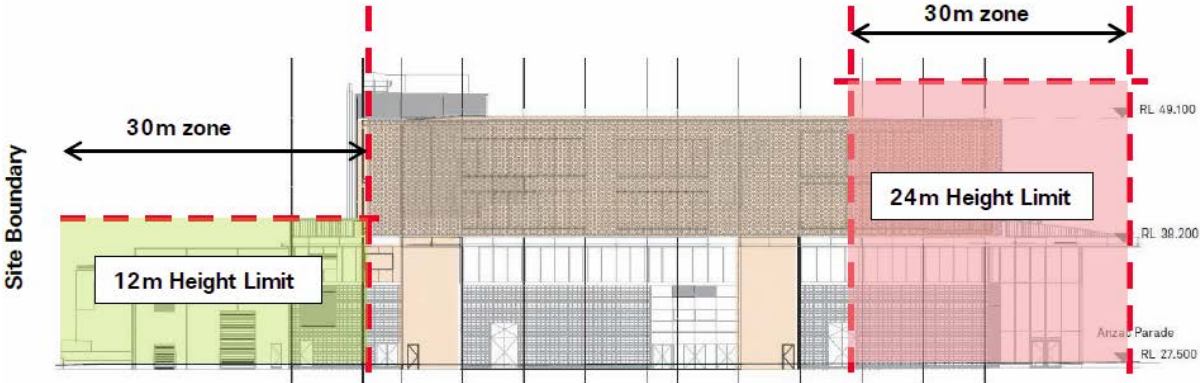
Southern Elevation Showing Proposed Addition (Source JBA)
